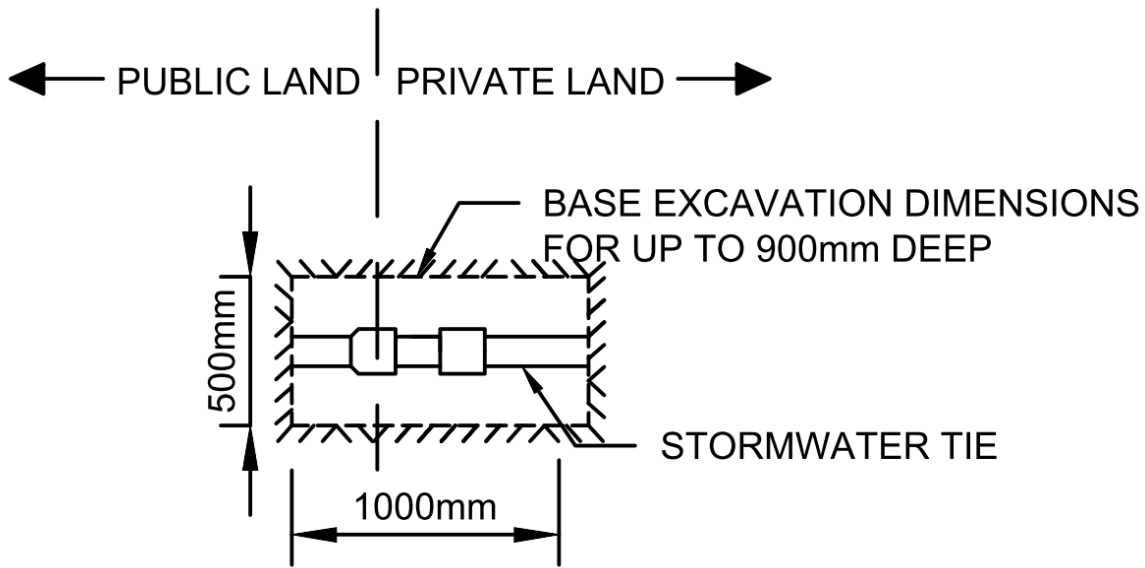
Plan View of Excavation Base Size for 0mm – 1000mm depth
